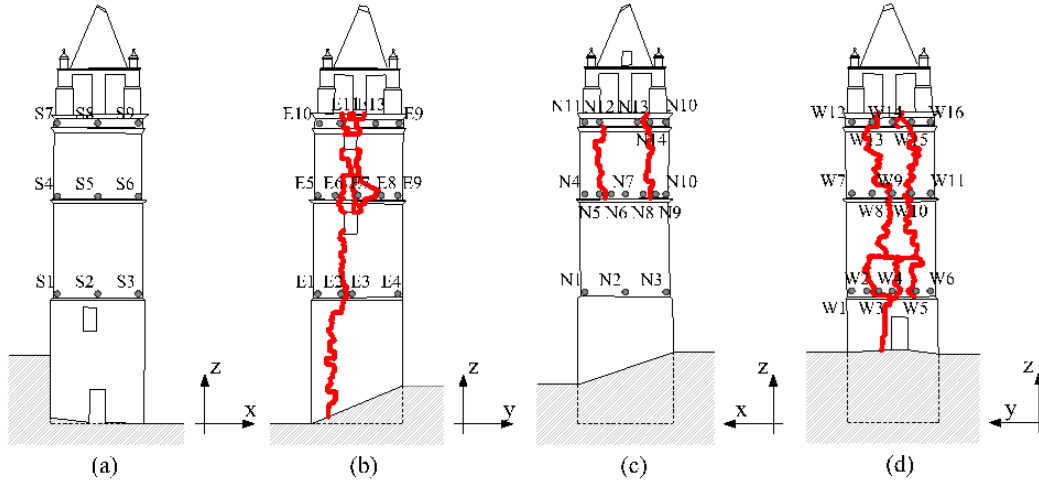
Sensor layout for AVTs: (a) South, (b) East, (c) North and (d) West façades [44], [45].
